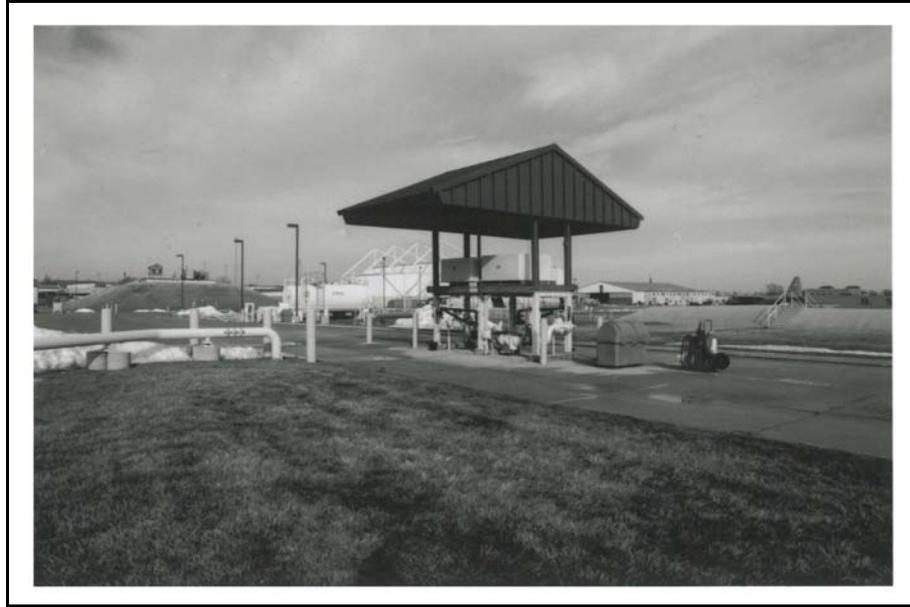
/4: View looking west toward Structure 309 (Jet Fuel Fill Stand, Truck). Gable structure shelters fuel pump apparatus for trucks.
